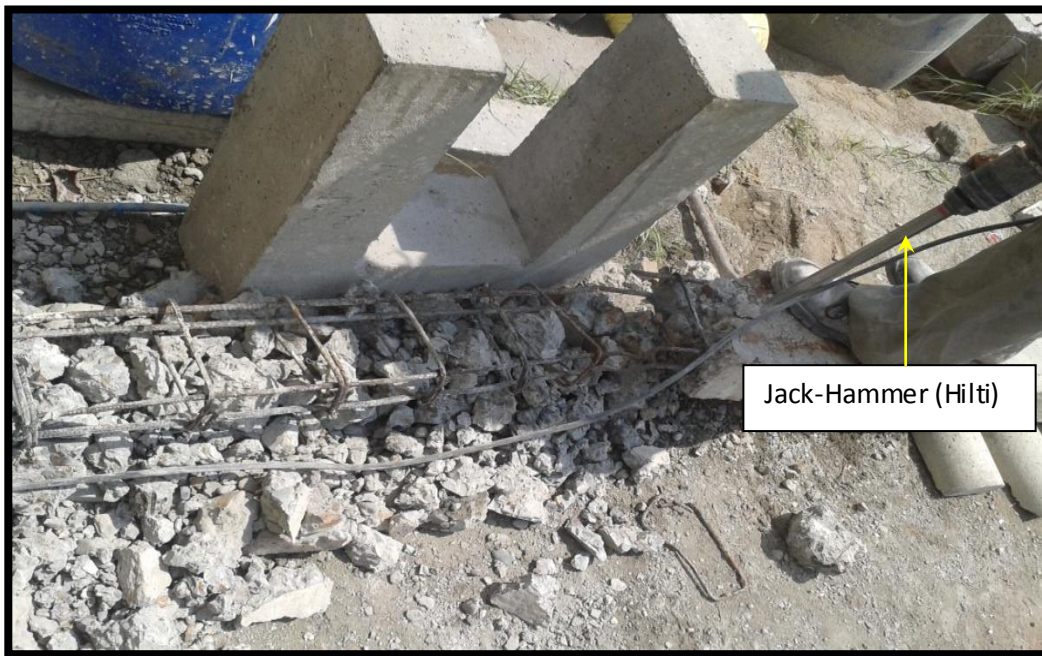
Jack-hammer used for dismantling of RC Beams
